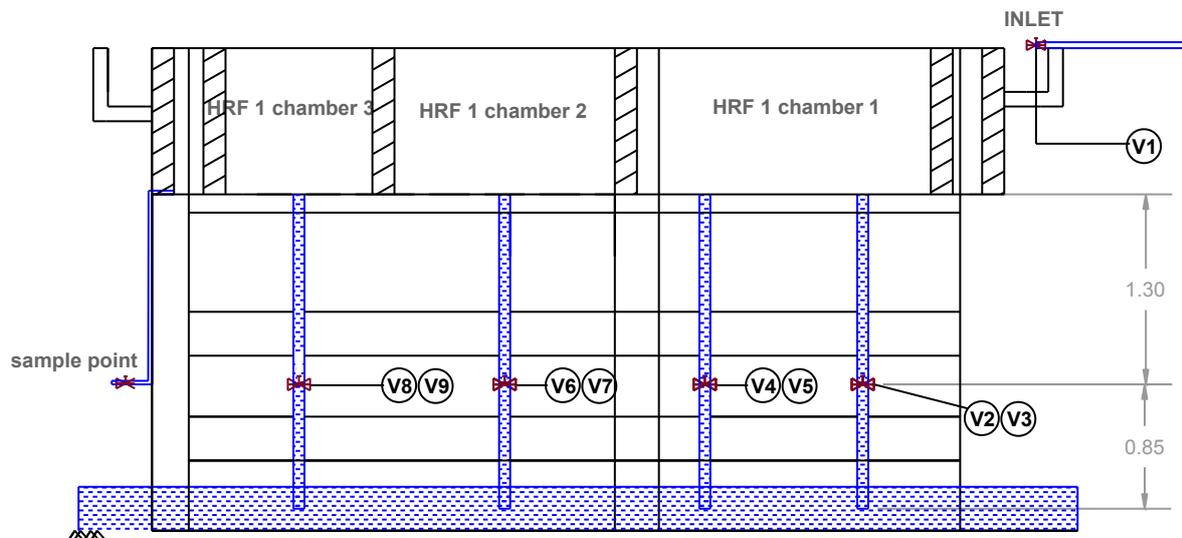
Plan view of HRF units with piping arrangements and v-notch locations
